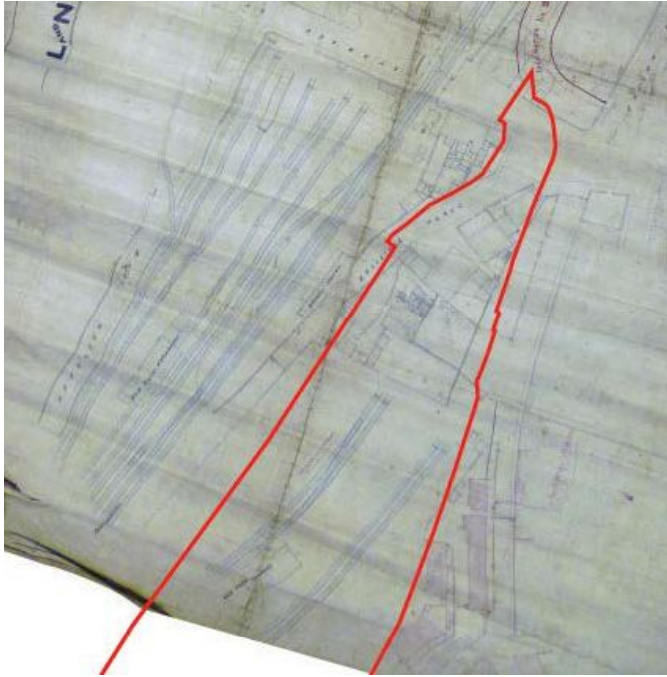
(left): Railway plan, 1884 (CAC(W) TBR 1/3/16/1 1884)
